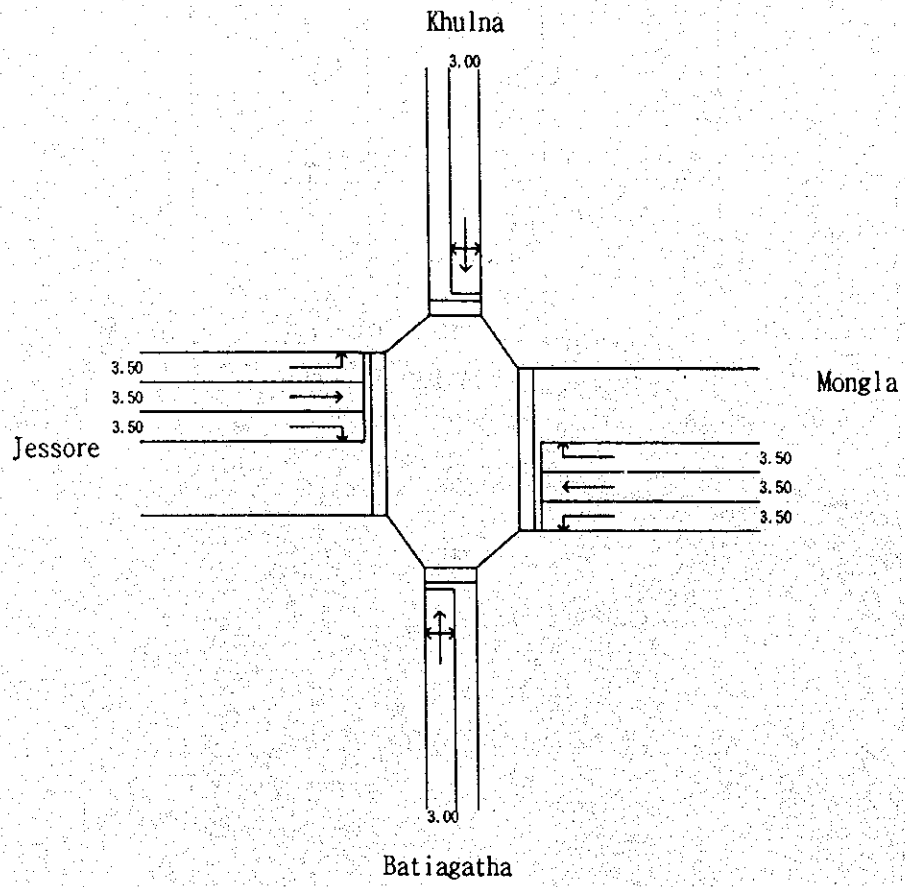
Intersection Layout (Mohanmad Nagar)
